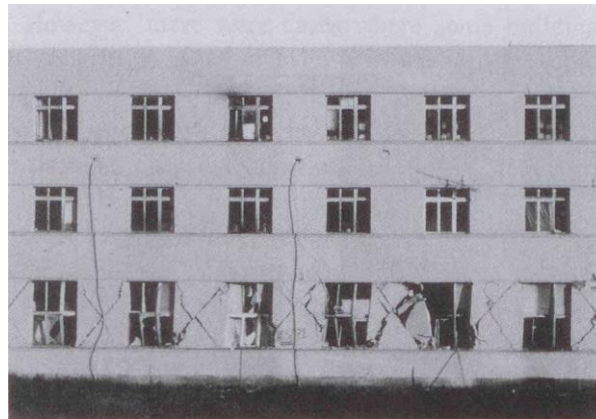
Typical shear cracks in window piers of brick masonry building, Budva, Montenegro, 1979 (from Tomažević, 1999).
